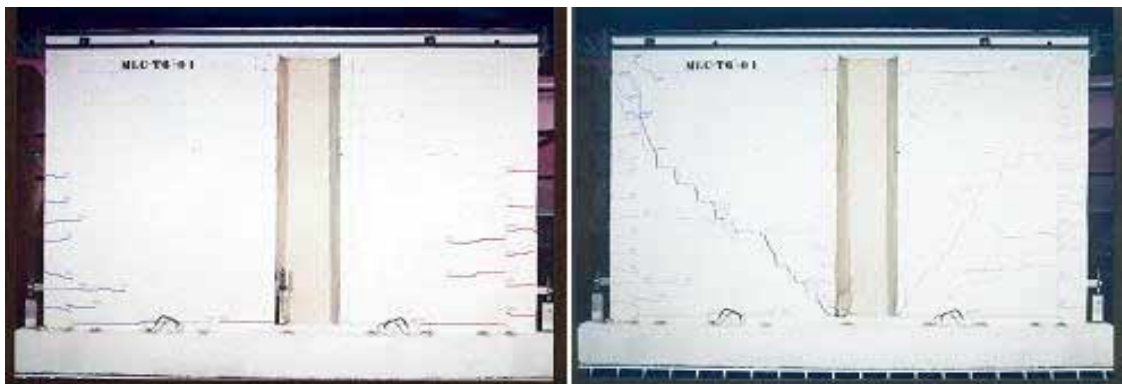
Damage of hollow clay brick masonry wall (pattern 4) before diagonal cracking (left) and after its (right)
